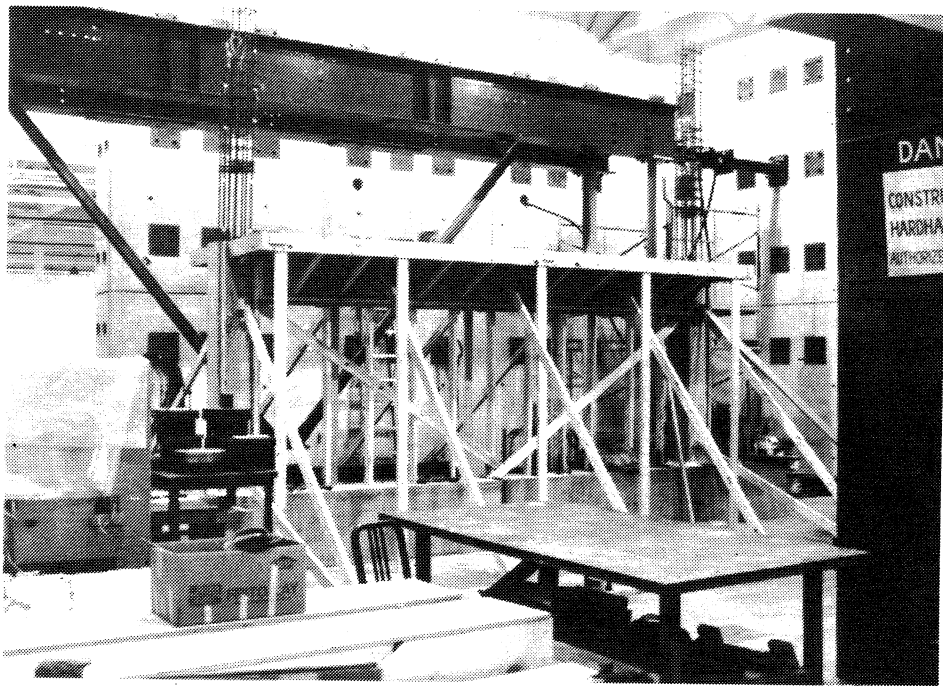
First-Story Beam and Slab Formwork Shoring
